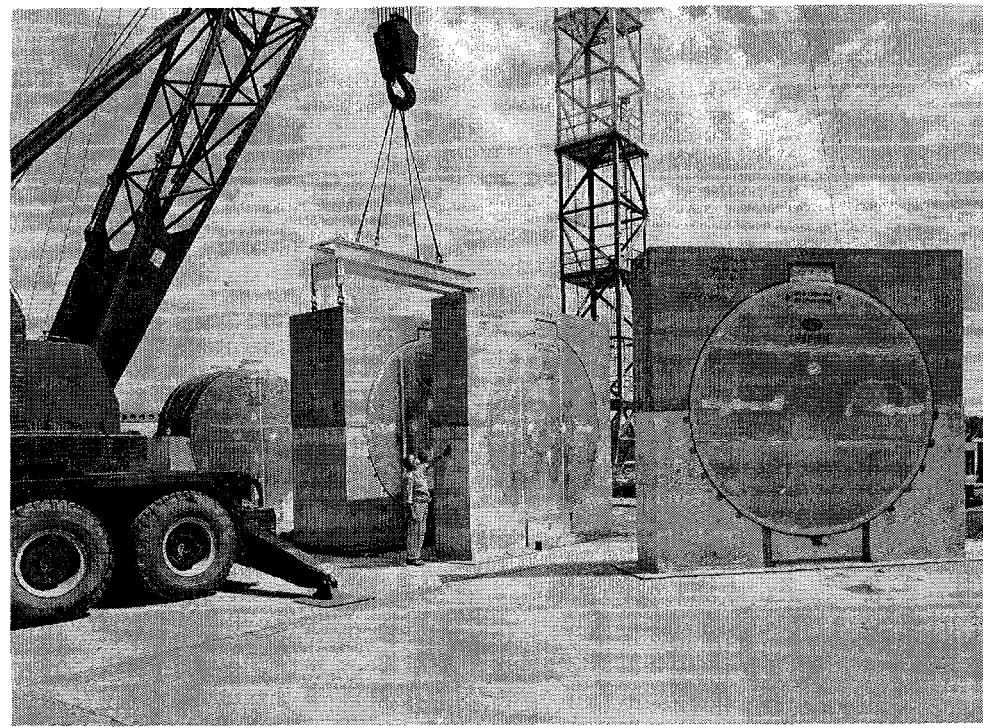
Photograph of Sodium Tanks and Concrete Collars.
